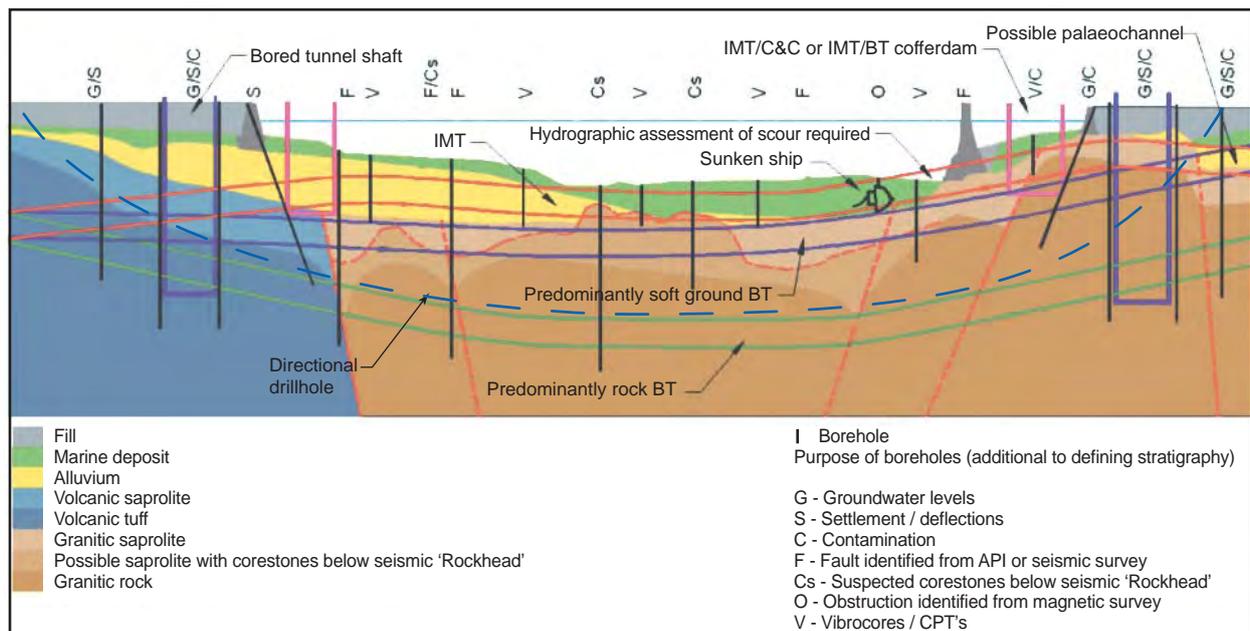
Typical layout of investigations for a marine tunnel crossing
